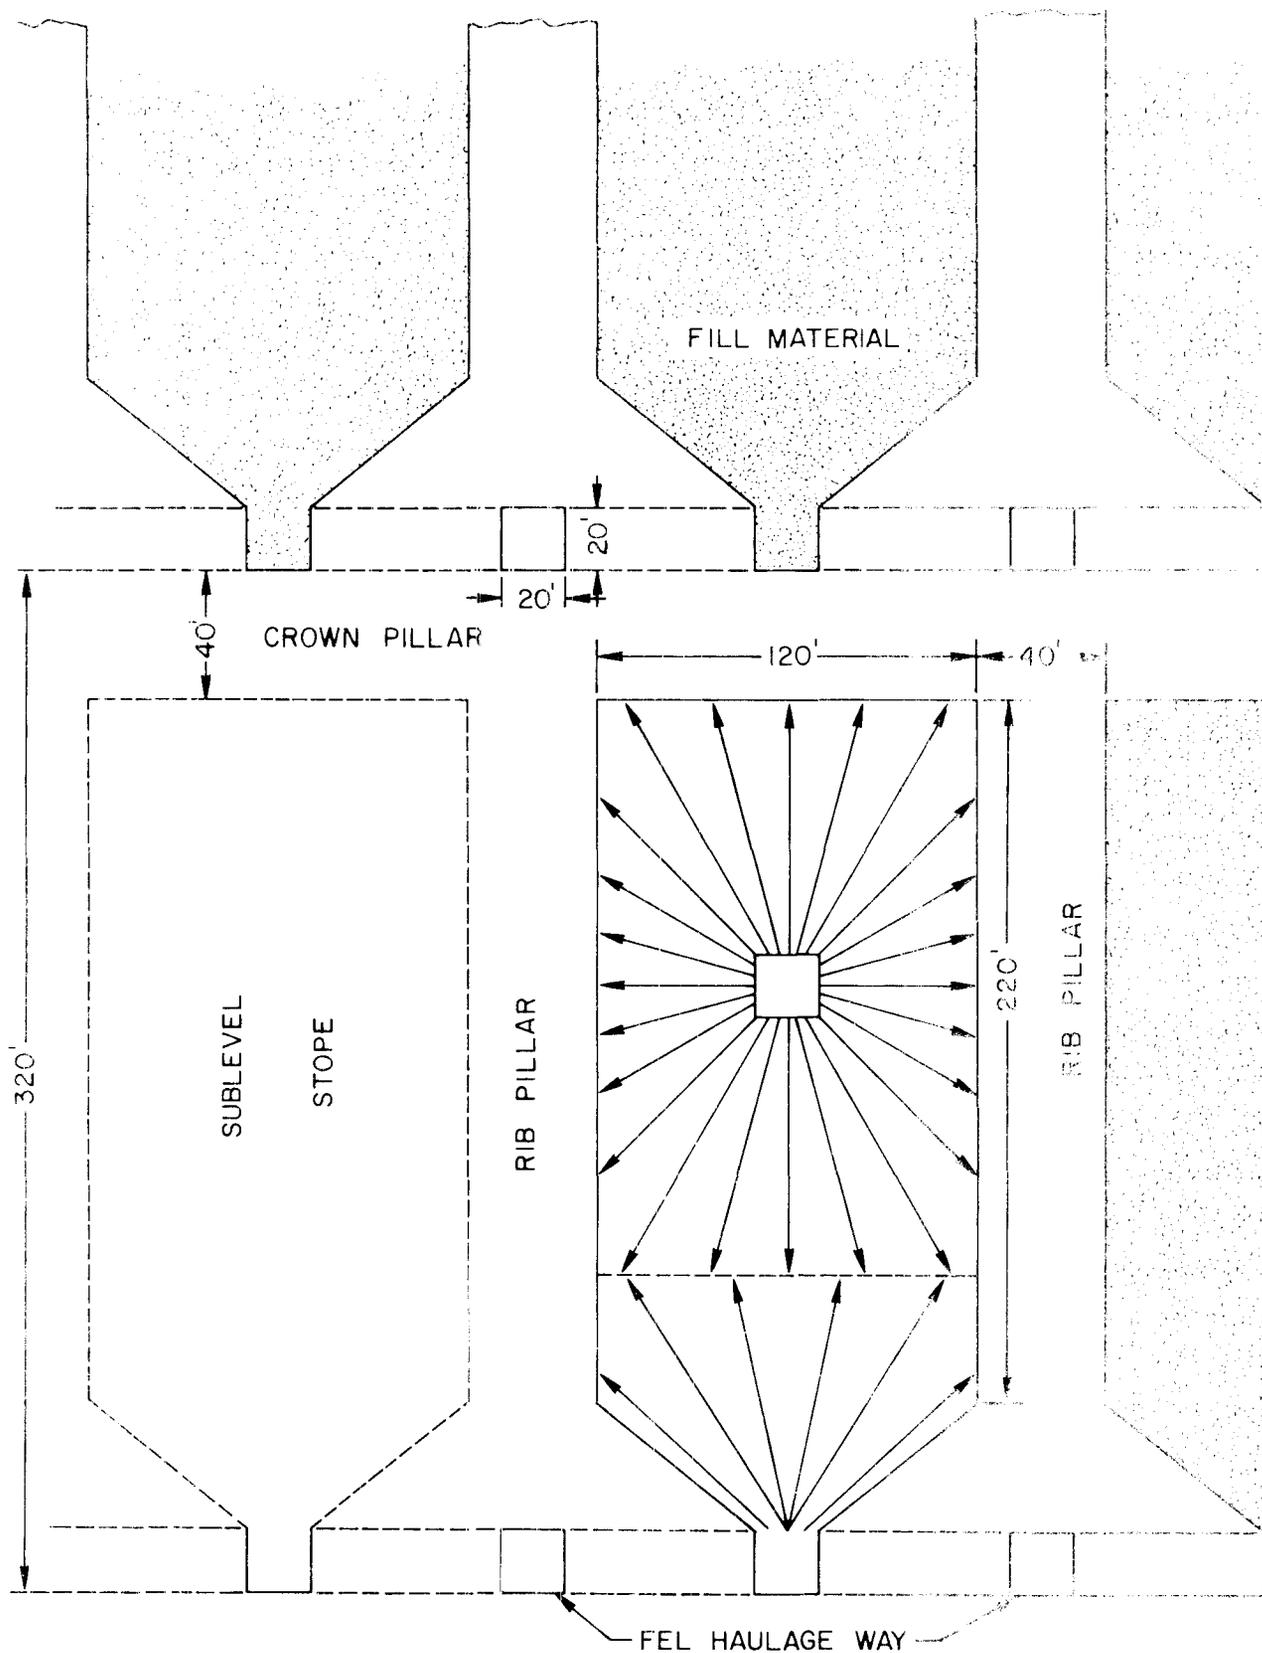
Vertical Section Through B-B', Sublevel Stoping with Cement Shale Backfill
